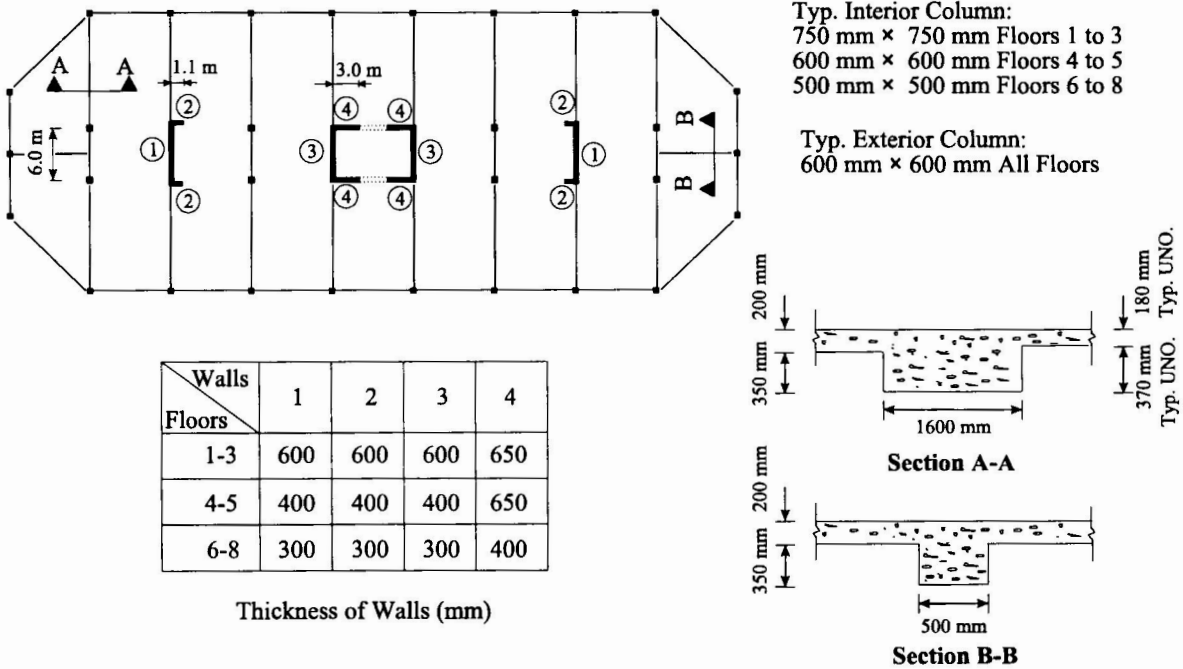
OPTIMIZED FLOOR FRAMING LAYOUT FOR VANCOUVER
